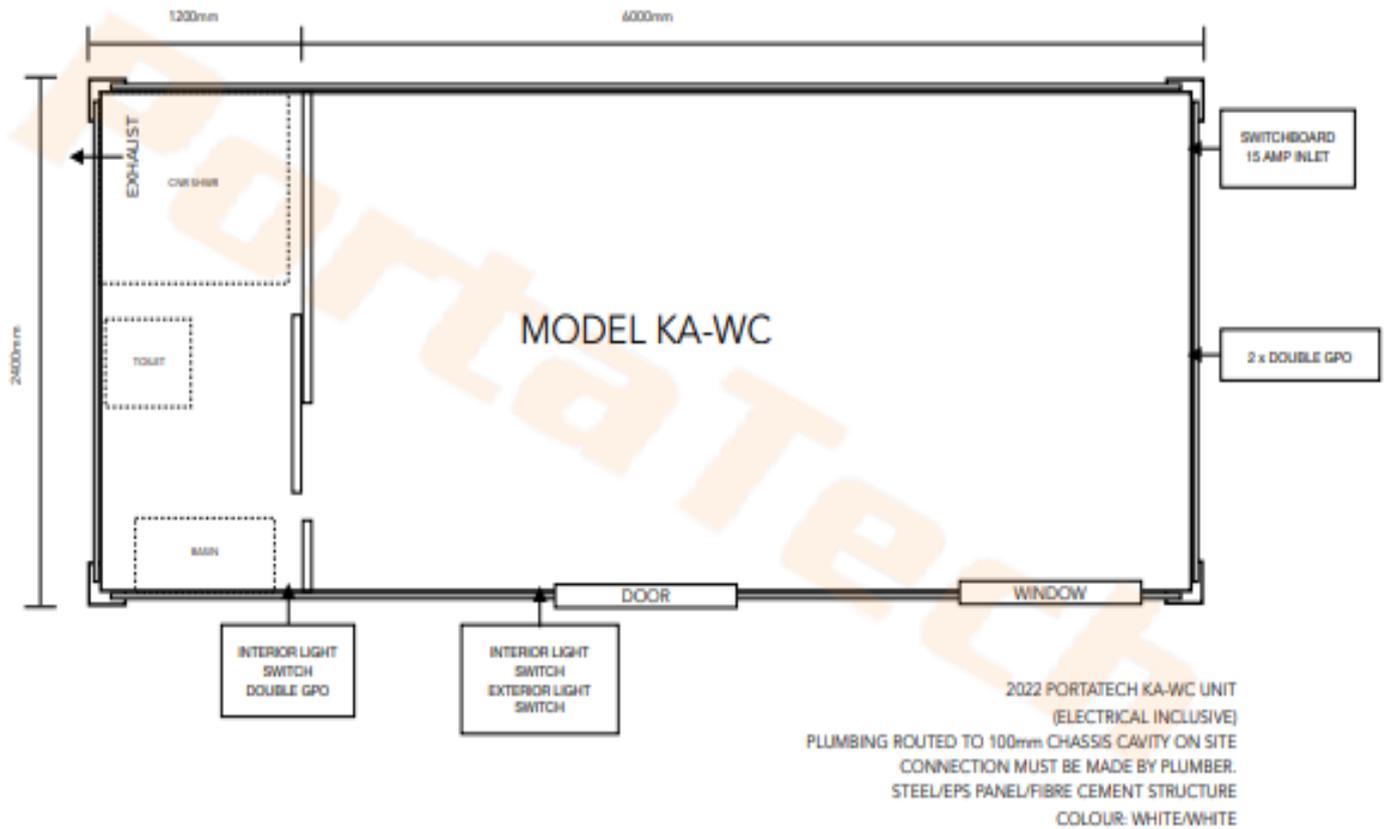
Detailed floor plan of accommodation units including plumbing and electrical layout
